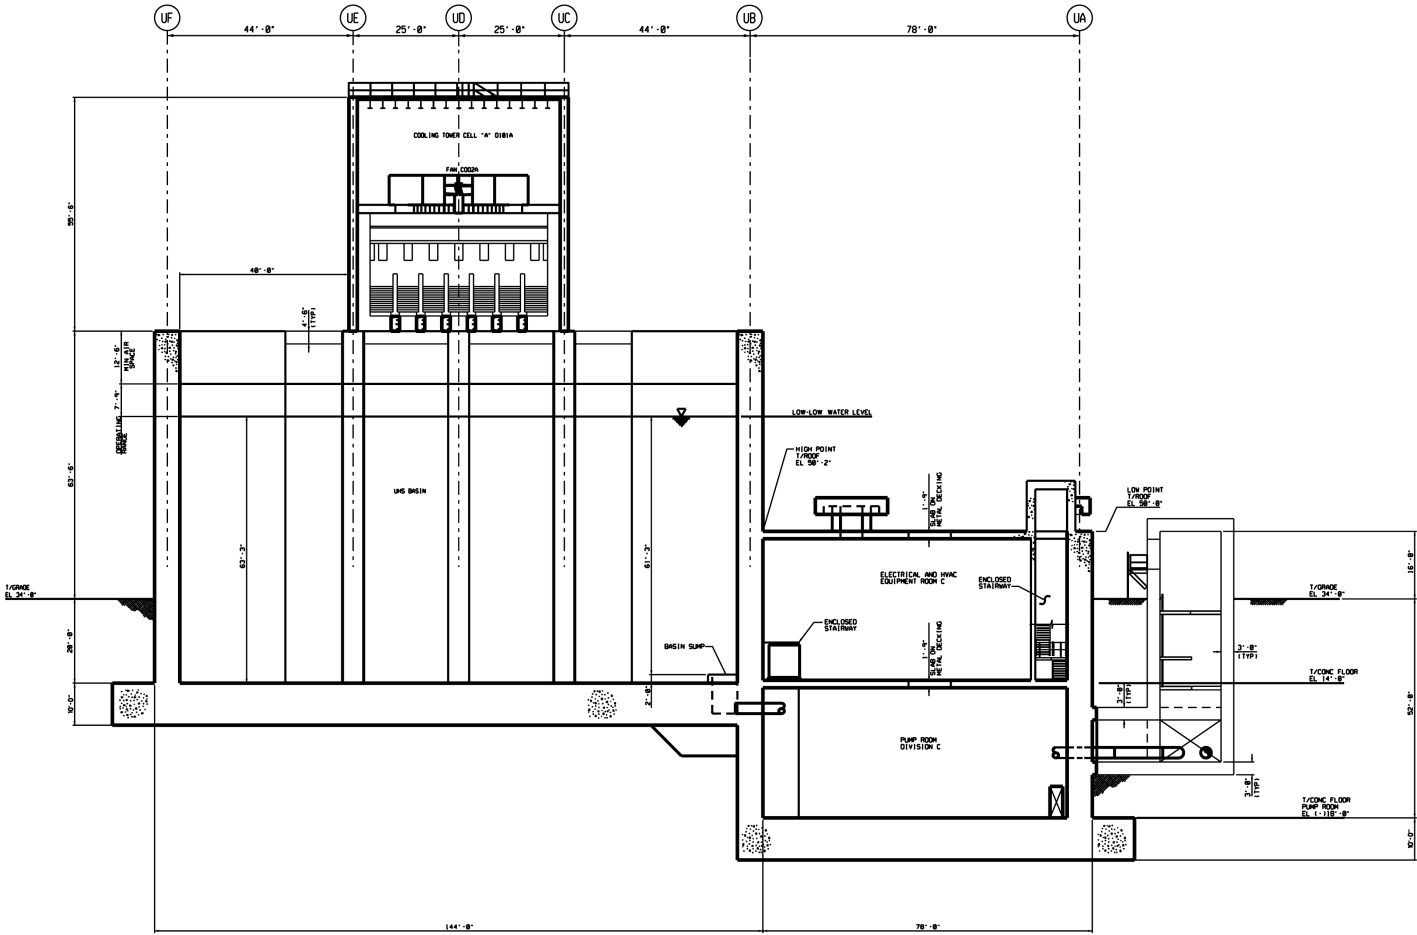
H.6-261 UHS/RSW Pump House, Section 1
